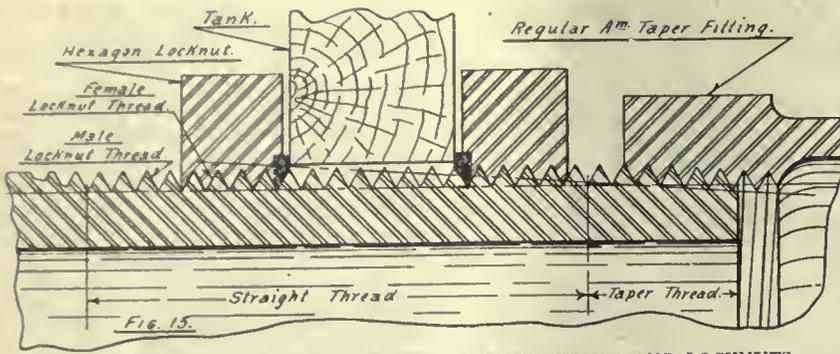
TANK CONNECTION WITH STRAIGHT THREAD AND LOCKNUTS
